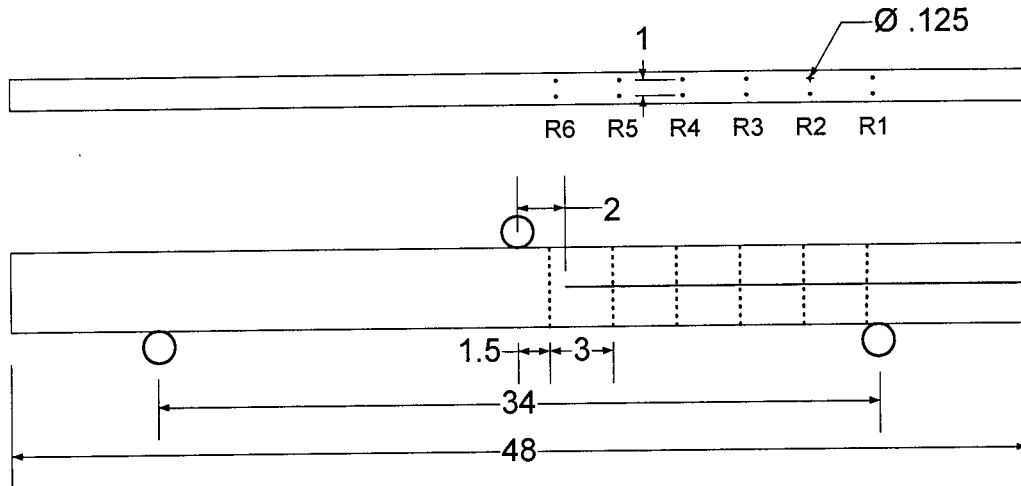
Specimen Geometry for 2x4s Showing Modified Spiking Order
